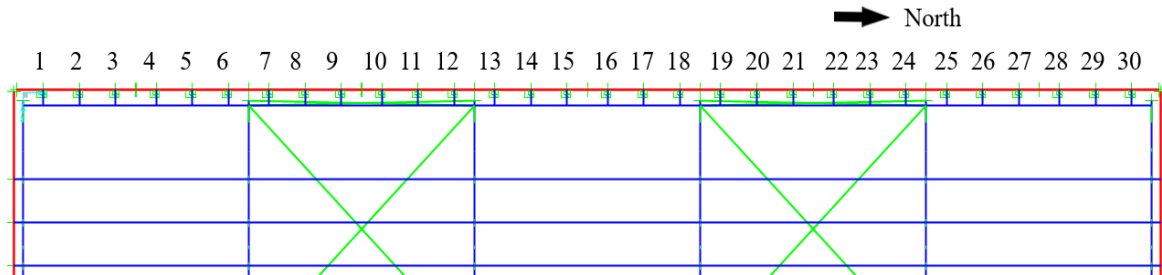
West Wall RFC Identification (Model 41 Plan View)
